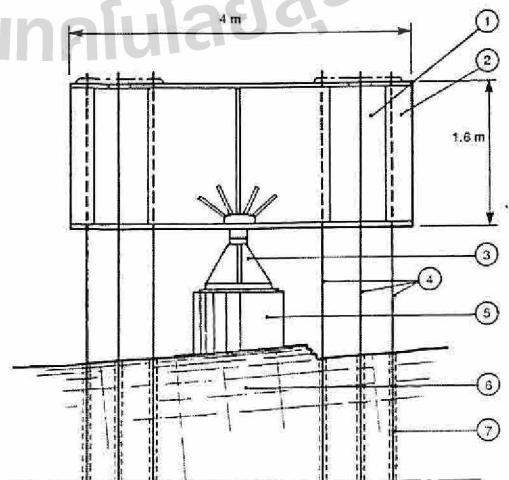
Typical arrangement of plate load test at ground surface (Pusch, 1992).
